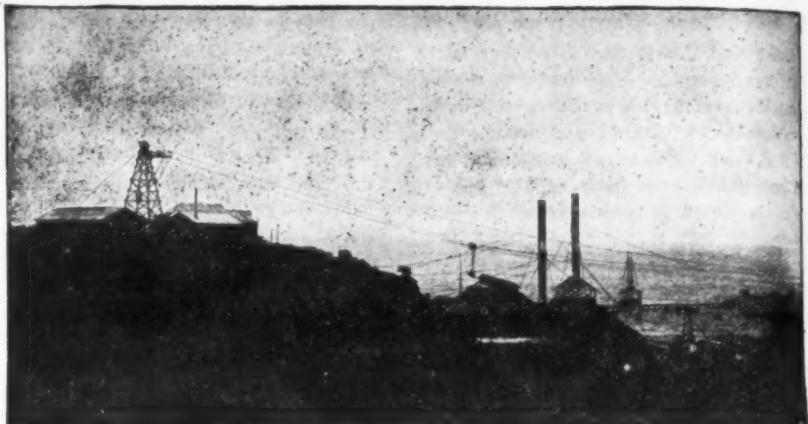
LIDGERWOOD CABLEWAY AT HILO, HAWAII.
